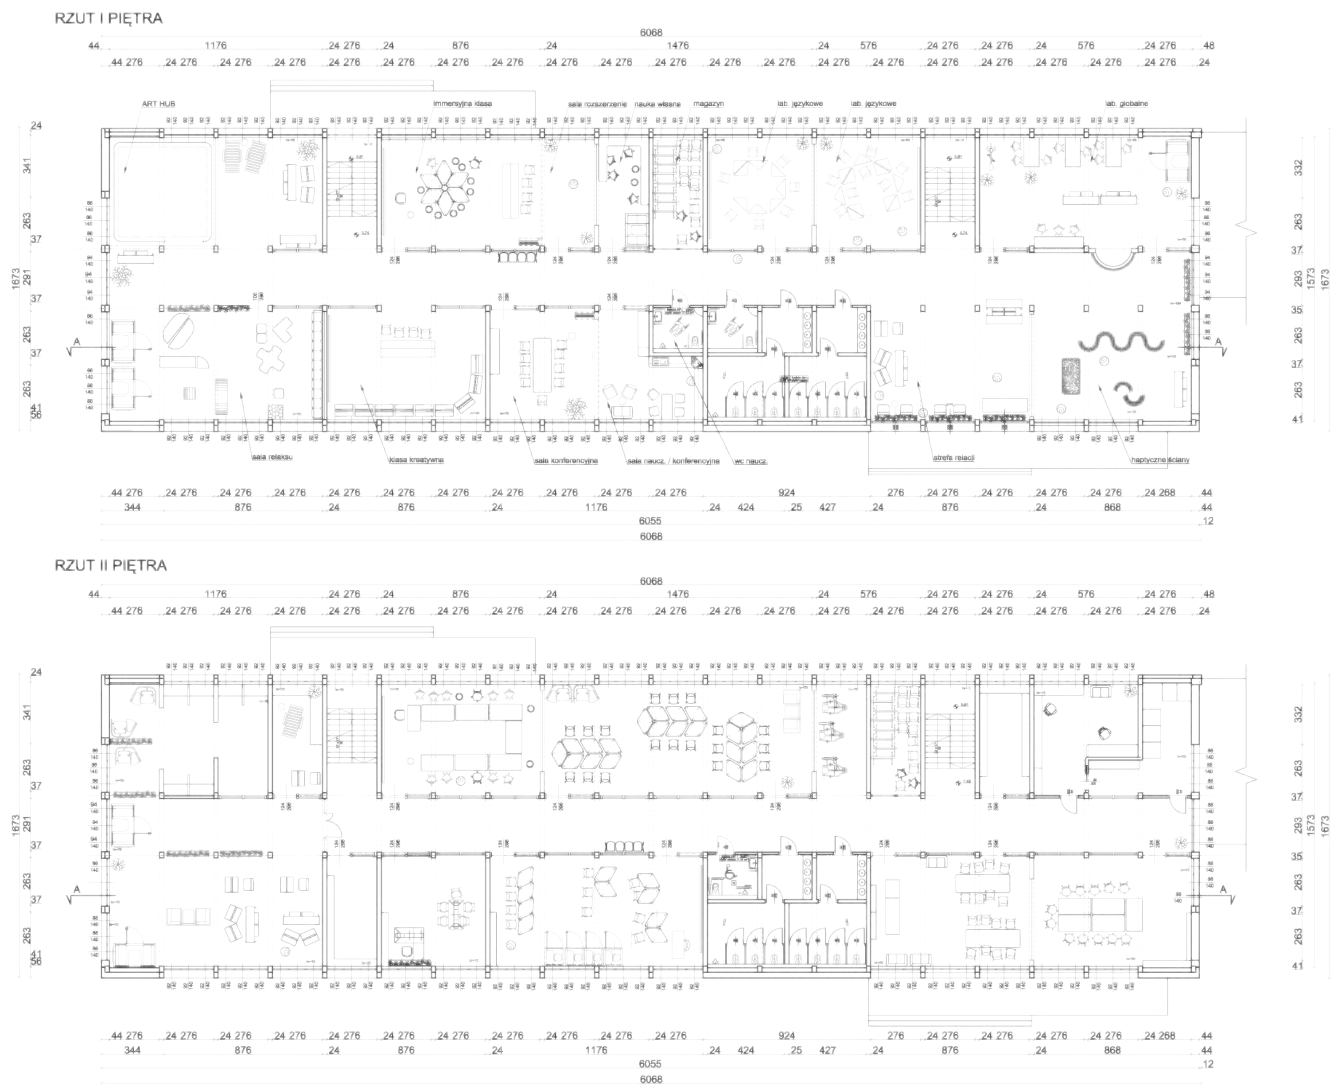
First- and second-floor plans, technical drawing, author's own elaboration.
